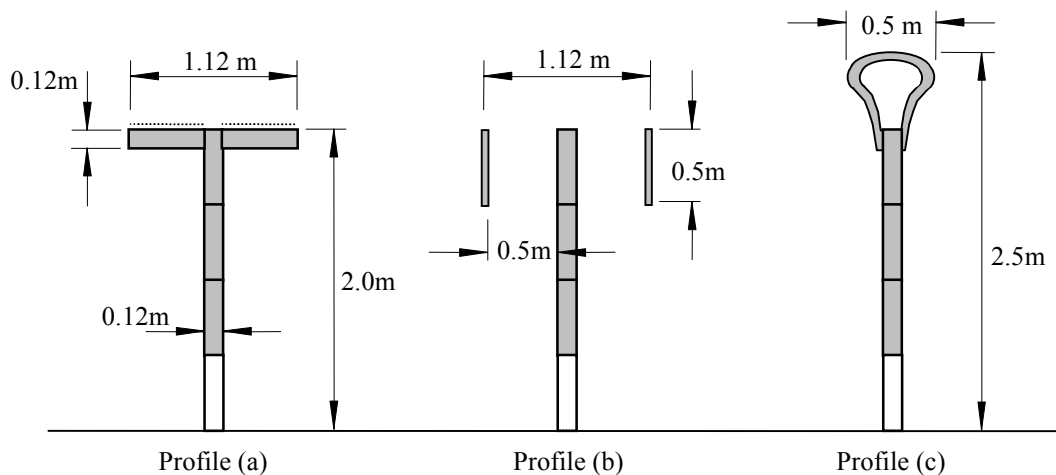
Test barrier profiles: (a) T-shaped barrier; (b) multiple-edge profile; (c) absorptive rounded cap
